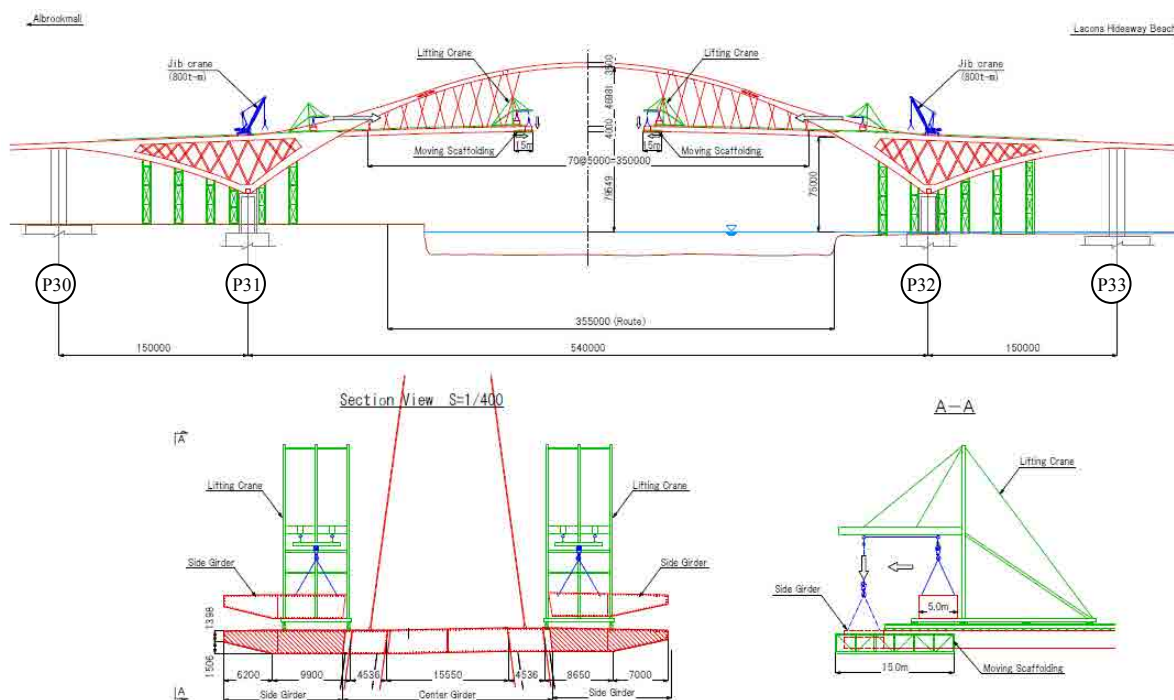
Erection Plan of Arch Rib (Lifting Method)
